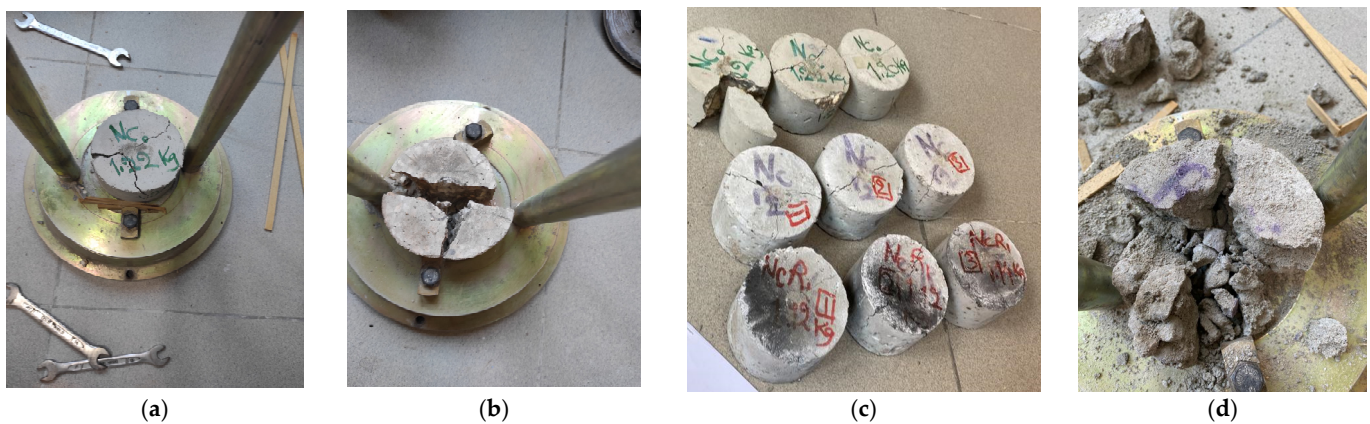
Specimen tested through impact with the modified device (a) first crack for NC-CR0, (b) fracture for RCC-CR0, (c) fracture due to impact testing for NC, and (d) fracture of RCC-CR1.
